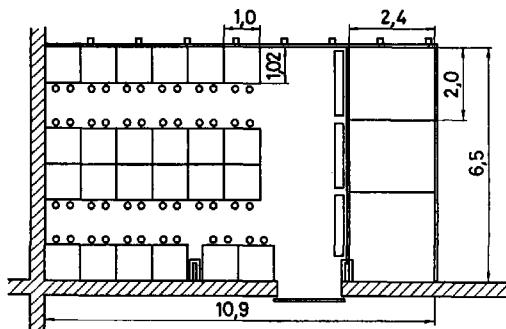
Layout of calf houses with insulation, mechanical ventilation and heating.
